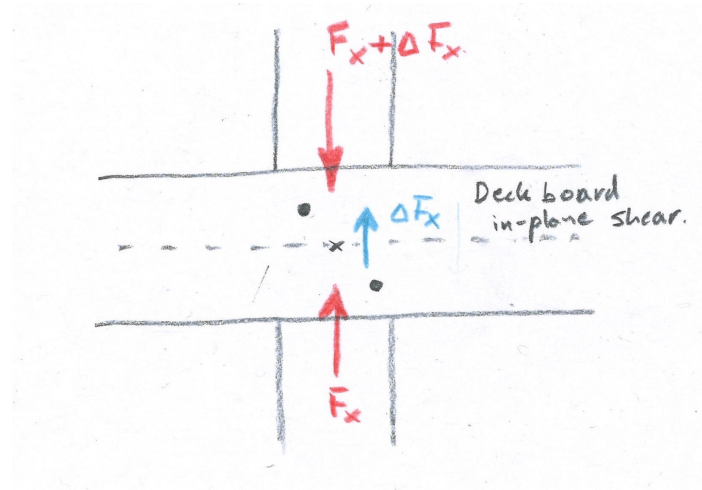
Sketch on how the fully restrained connection transfers part of the axial load in the longitudinal girders to the deck plate as a shear force
